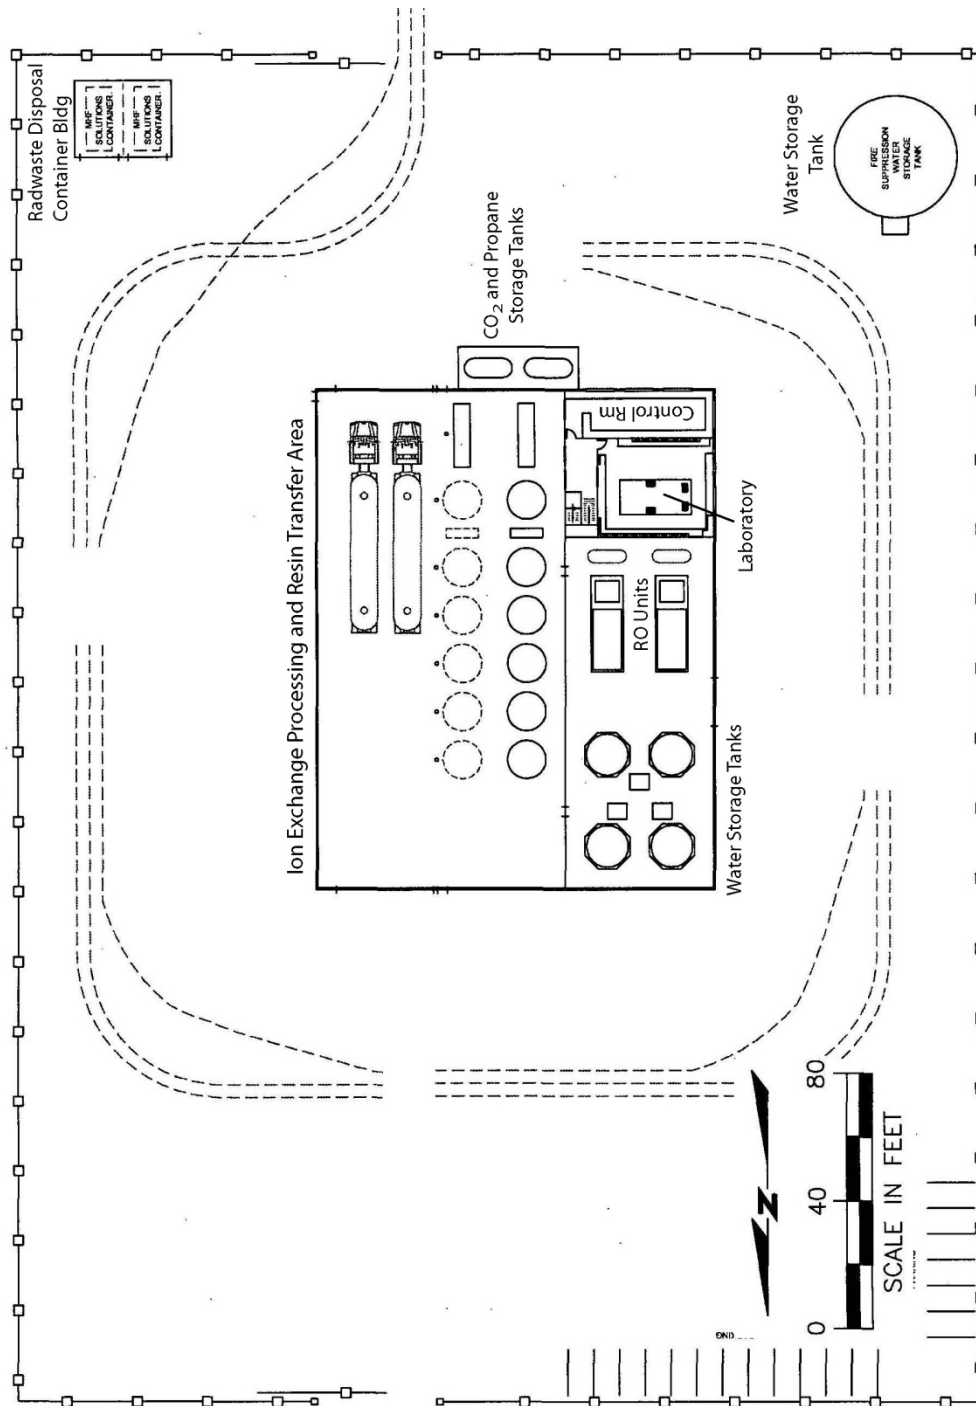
General Site Plan for the Dewey Satellite Facility.
